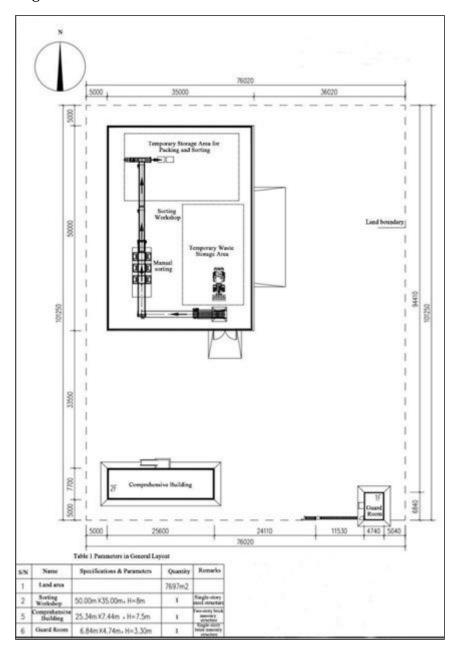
Layout Plan of Domestic Waste Sorting Center in Linwei District
